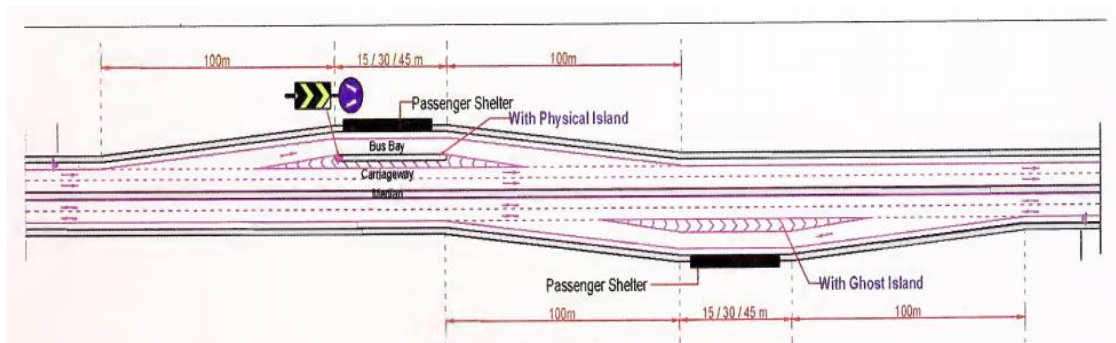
Typical plan layout of Bus bay & Passenger Shelter
